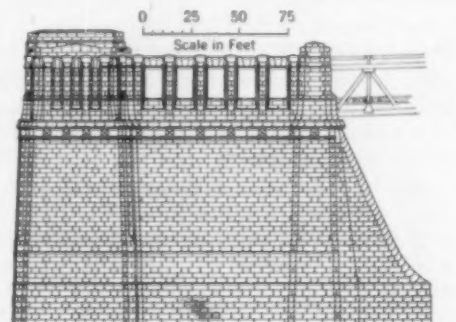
ORIGINAL DESIGN CONTEMPLATED FOR TRIBOROUGH BRIDGE ANCHORAGE
